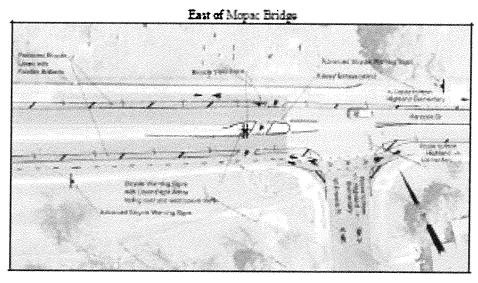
Planned Intersections to east and west of the Hancock Bridge over Mopac
